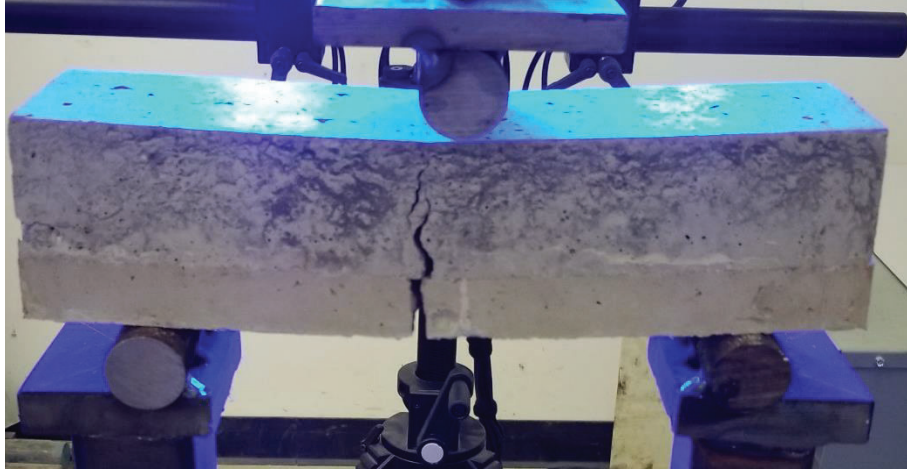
CTS Concrete Specimen in Horizontal Adhesion after Failure
